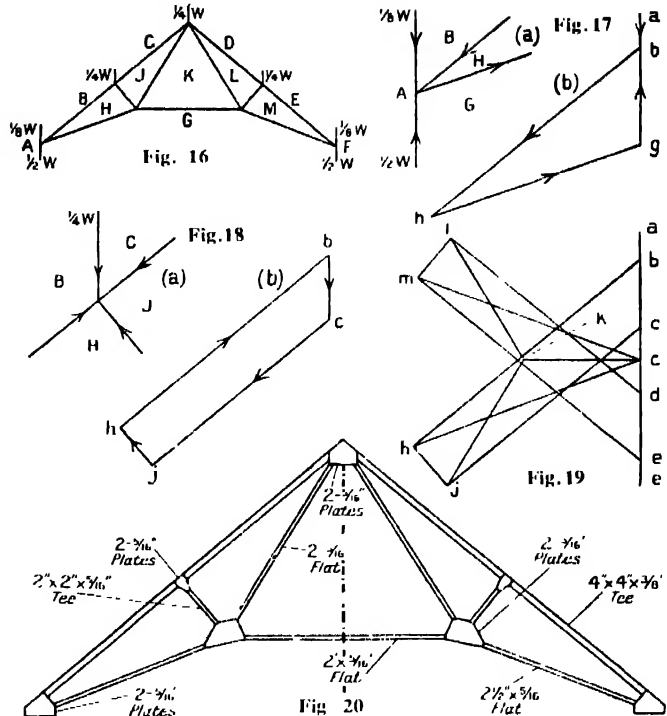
FORCES IN A ROOF TRUSS. A roof truss with members and joints marked. Figs. 17-19. Determination of forces in members of trusses. Fig. 20. Design of truss.
